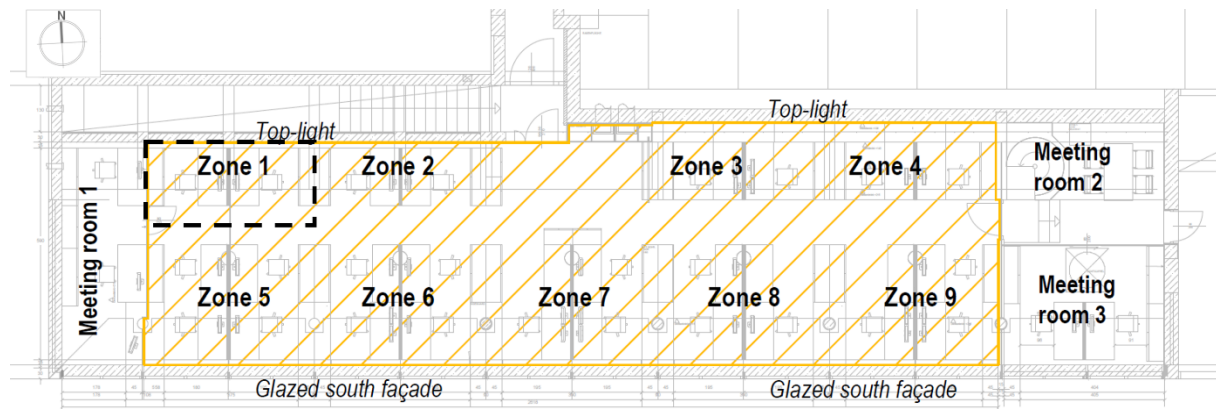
Floor plan of the study building, open-plan office with nine lighting zones
